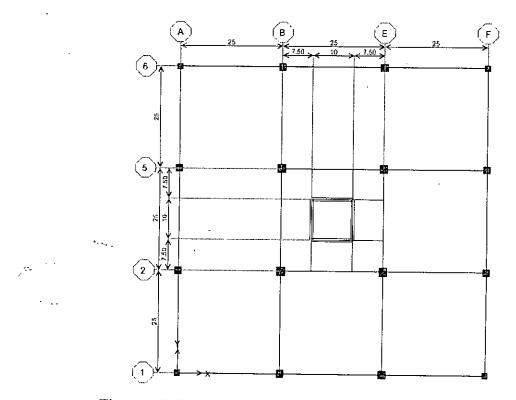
Plan view of ground floor in 25'x25' floor panel model
